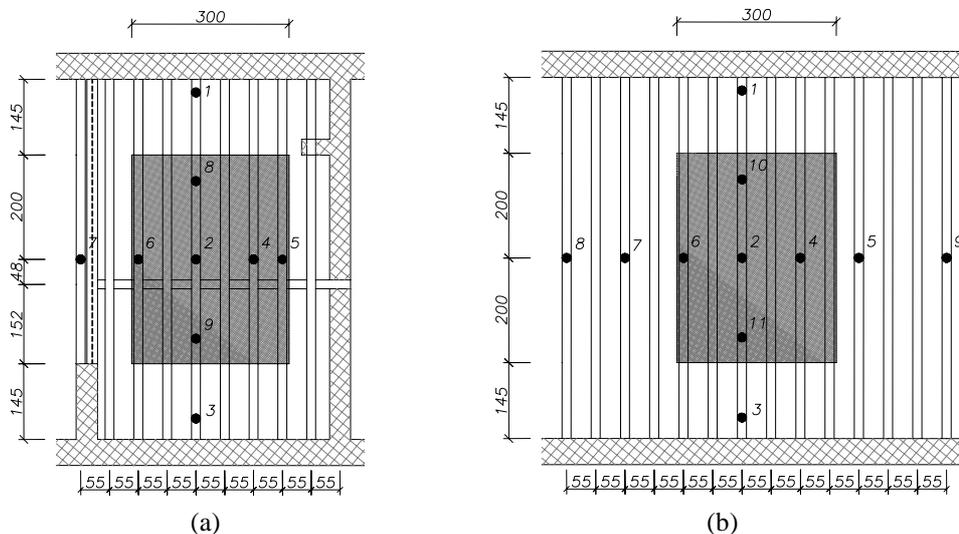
Loaded portion of the floors and position of the transducers: (a) floor 1, (b) floor 2.
